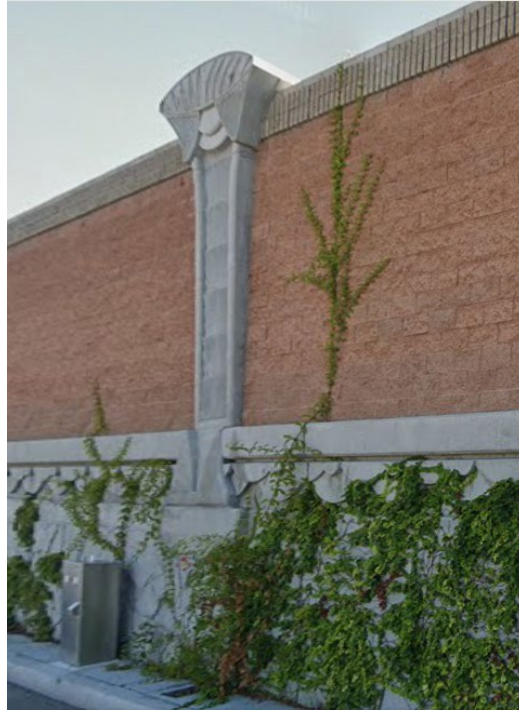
Community facing Soundwall/Retaining Wall
